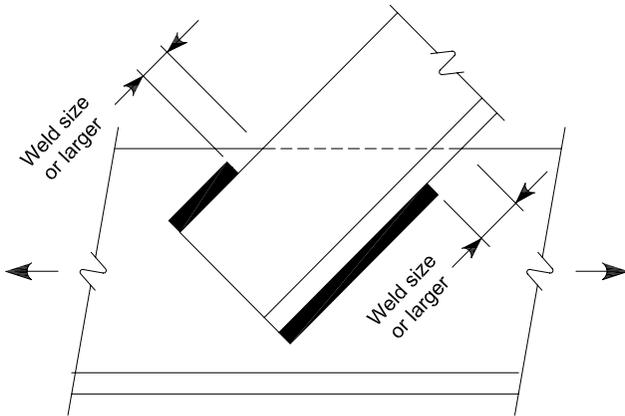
Fillet welds near tension edges.
